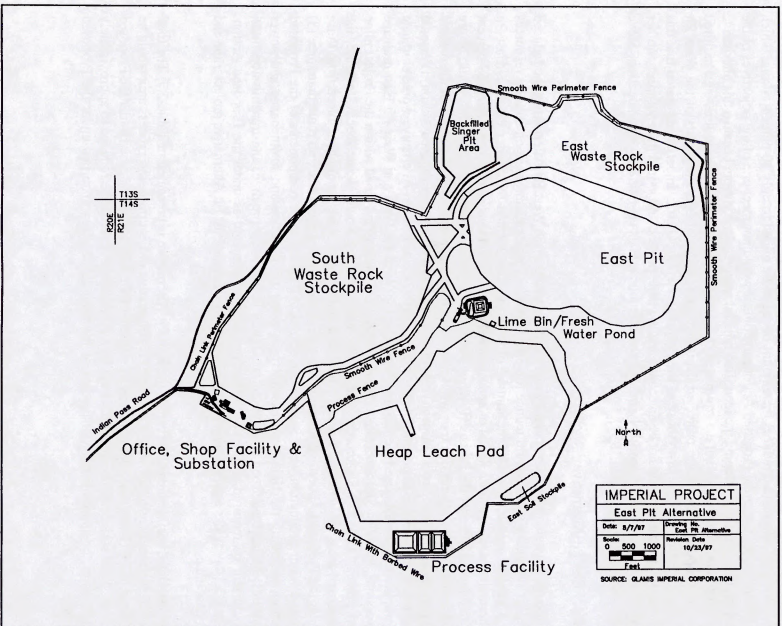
East Pit Alternative - Mine and Process Area Facility Details
